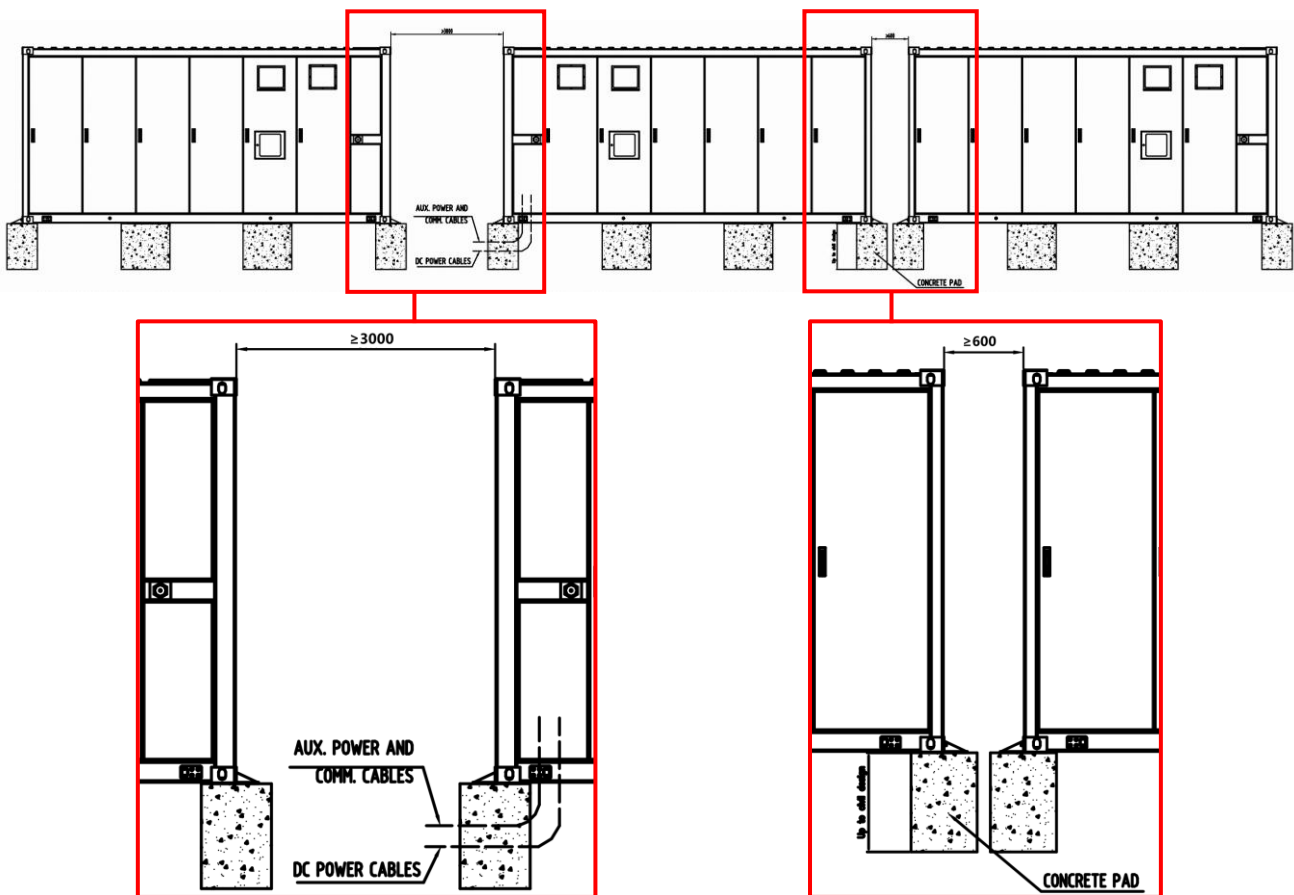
Front View of Installation Foundation (Unit: mm)
